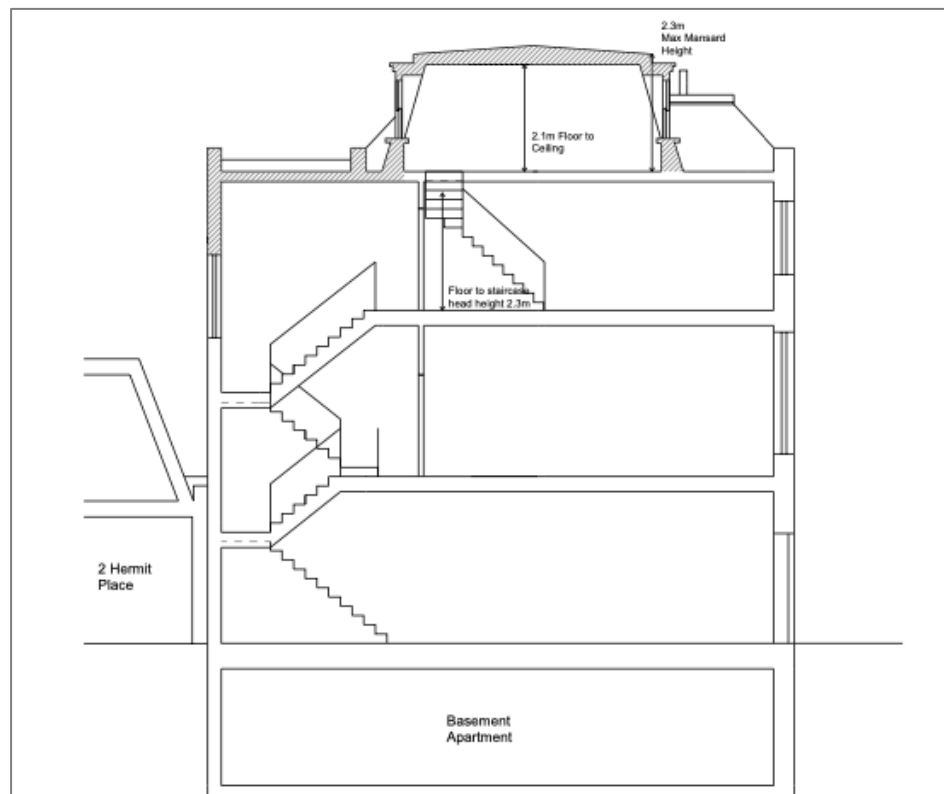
Section plan showing section details of the proposed mansard roof extension and alterations to the rear outshoot
